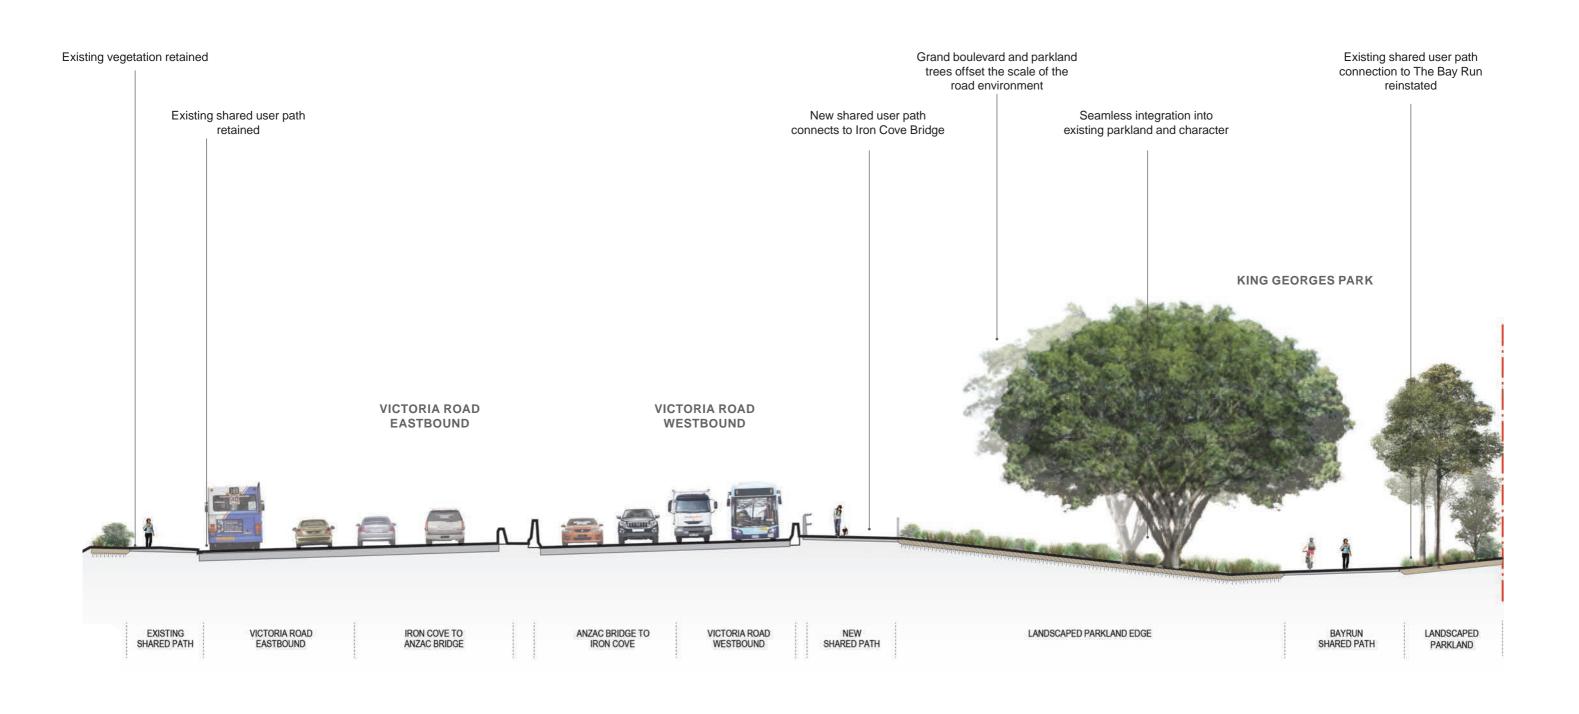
Iron Cove Link - Landscape Concept Plan - Drawing 2 of 2
